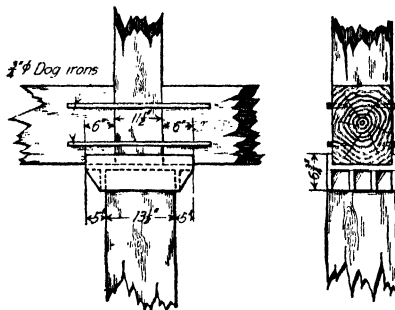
Details of column and girder connection with special cast-iron post cap.
